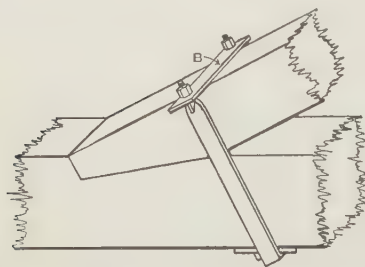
Strap for Joint between Rafter and Tie Beam.
